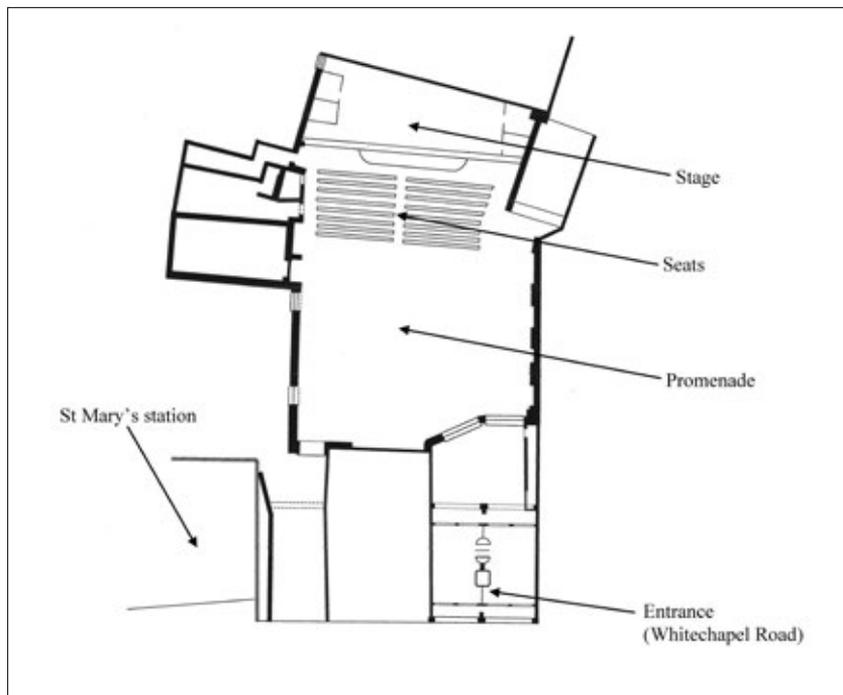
• Plan of Wonderland music hall (drawn from the approved architect's plan, January 1896, London Metropolitan Archives GLC/AR/BR/19/0574).
